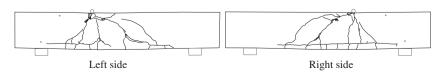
Crack pattern obtained for Beam 2 (with stirrups) strengthened with plain concrete.
